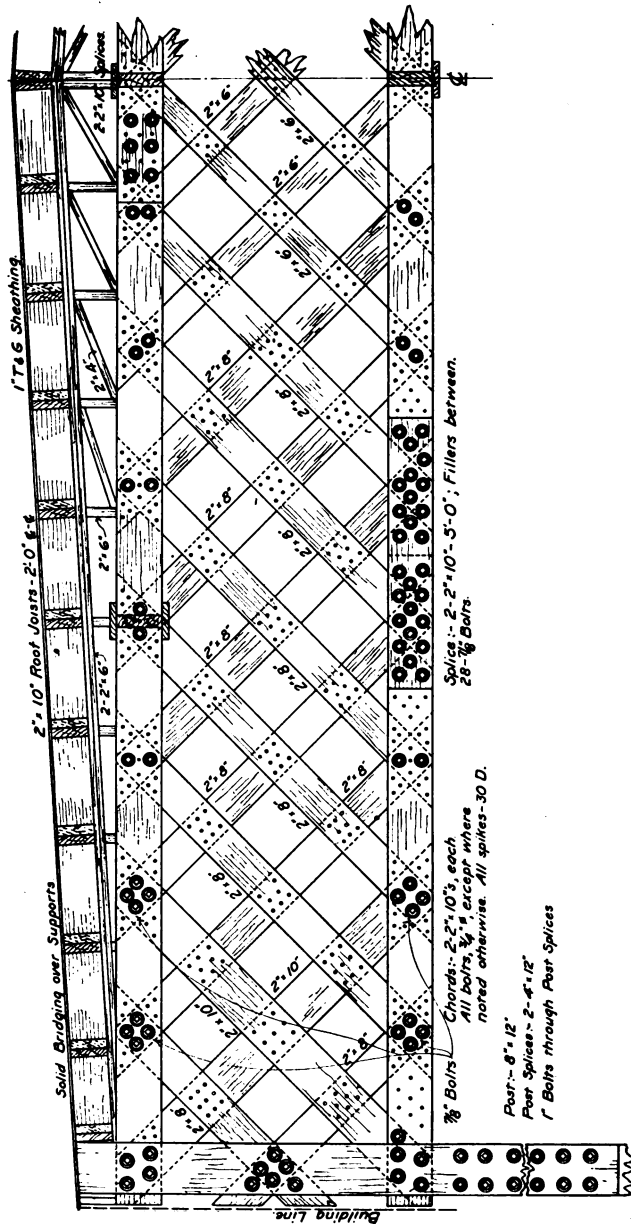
HALF-ELEVATION OF LATTICE-TRUSS.
